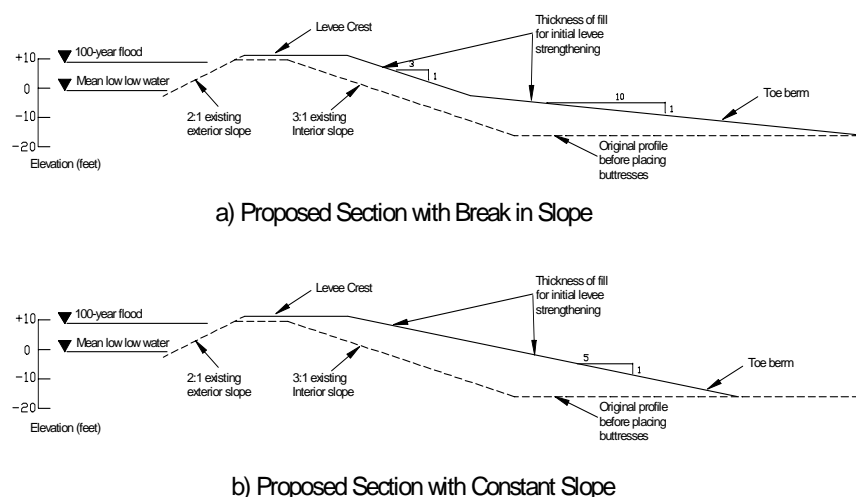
EMBANKMENT SECTIONS PROPOSED BY DELTA WETLANDS
